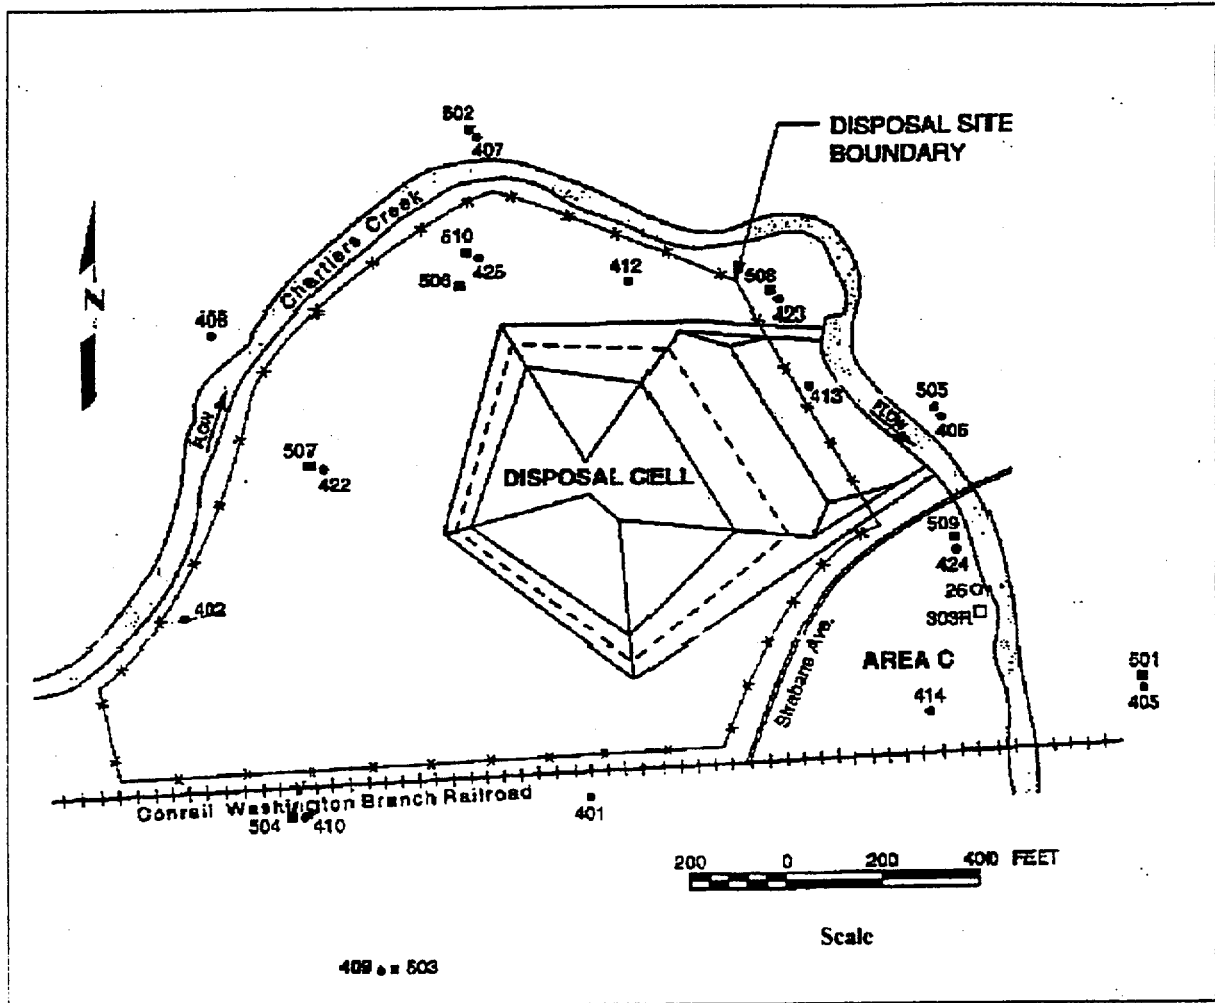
Present Day Site Layout for the Canonsburg UMTRA Mill Tailings Facility
